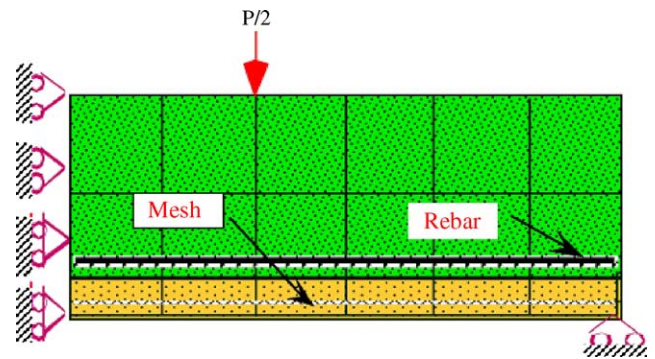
Finite element model of half composite ferrocement-reinforced concrete beam.
